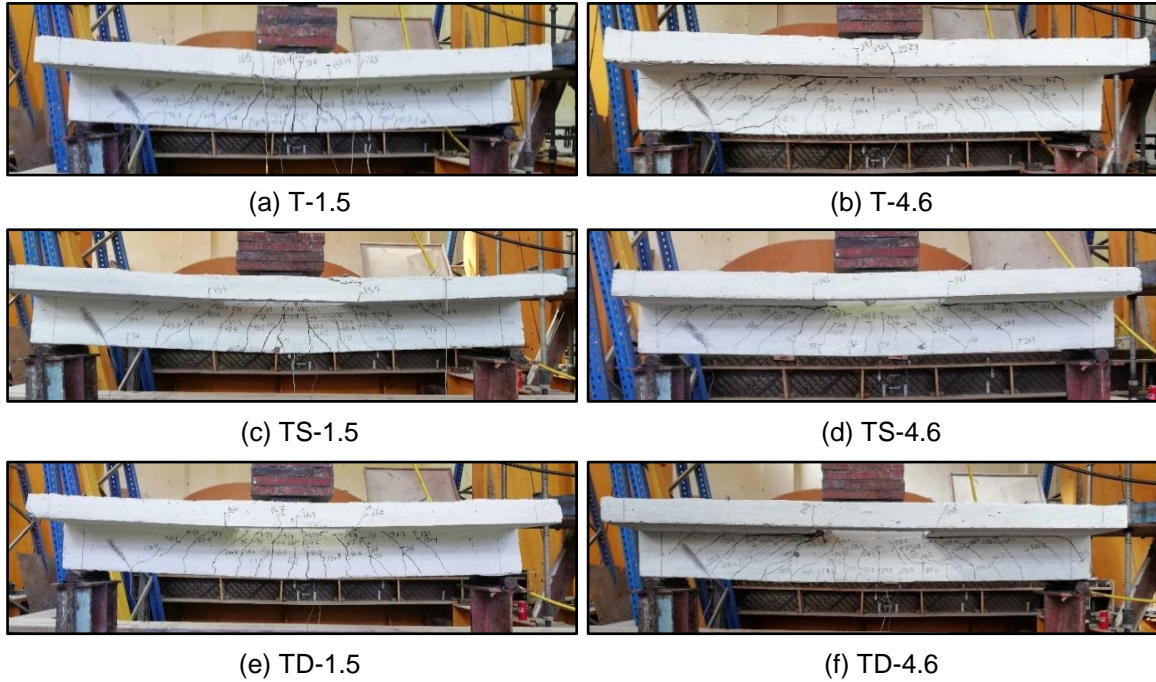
Crack Pattern at Failure Stage of the Tested Beams
